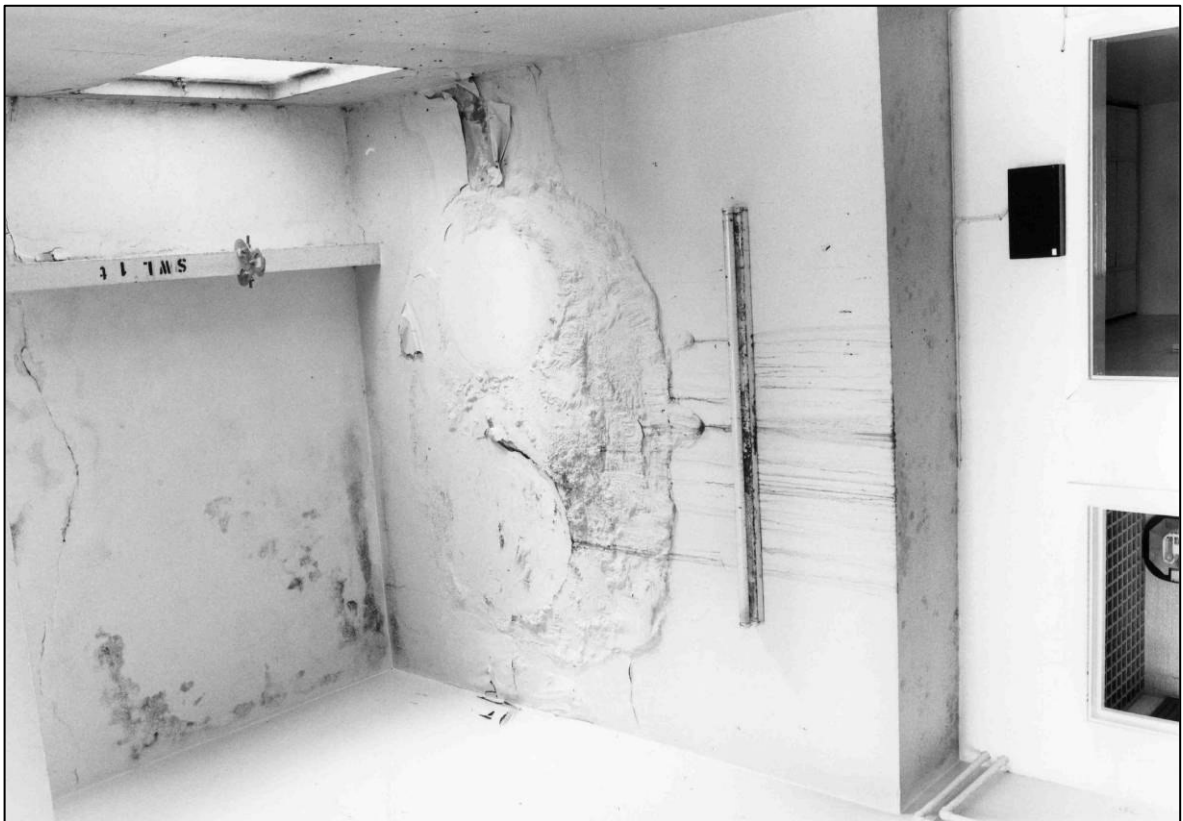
Staircase 1F4, upper part W wall, looking SW (photo 4/5) (top to left).
